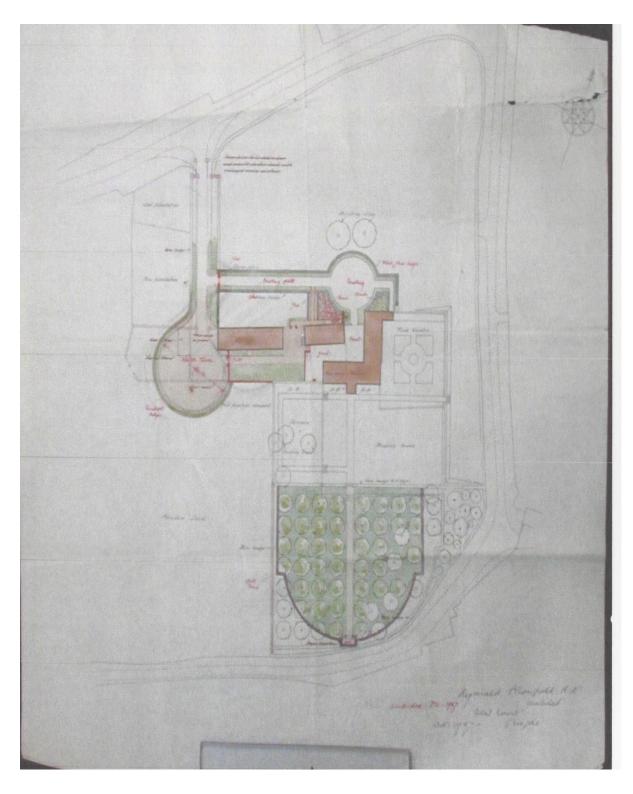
Blomfield's plan for the garden, 1927. Sulgrave Manor & Garden.
